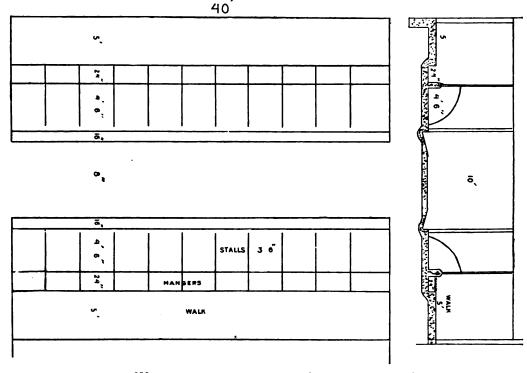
BARN FOR COWS AND SHEEP (FLOOR ARRANGEMENT).
